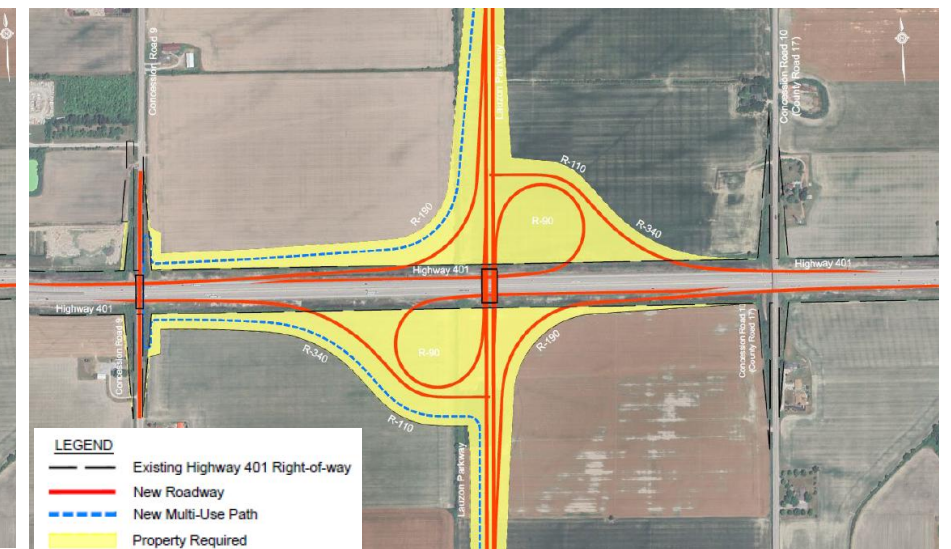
Alternative 3 – MUP on Concession Road 9 New Bridge
